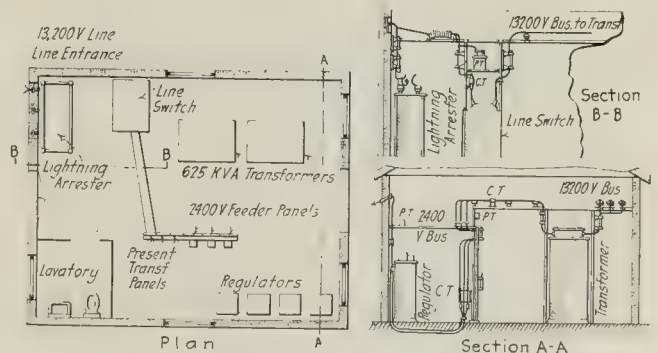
ARRANGEMENT OF EQUIPMENT IN CANTONMENT SUBSTATION
